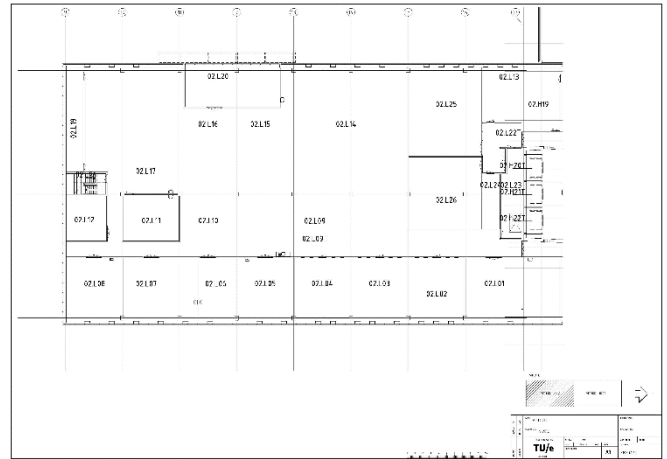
Floorplan of 2nd floor South side of the Vertigo.
